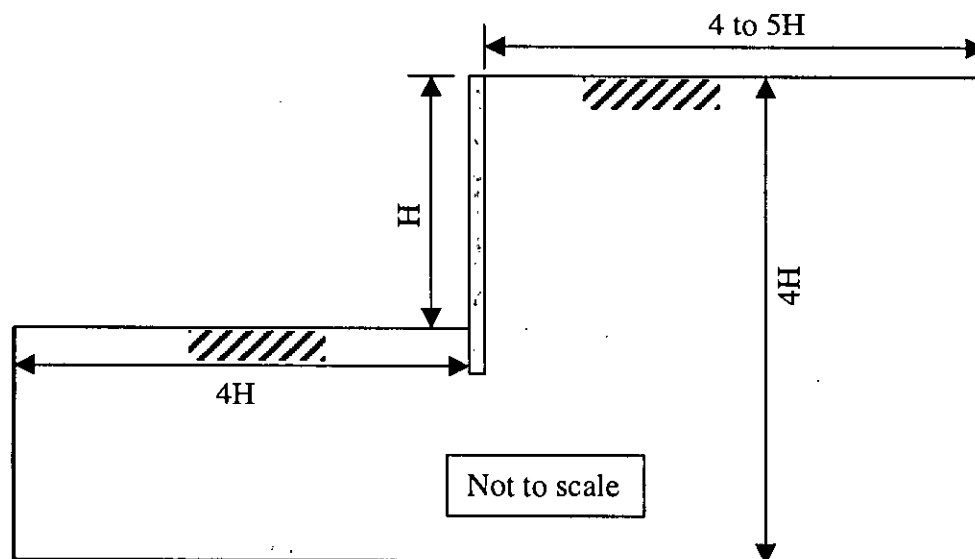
Boundary locations of a numerical model of retaining wall
